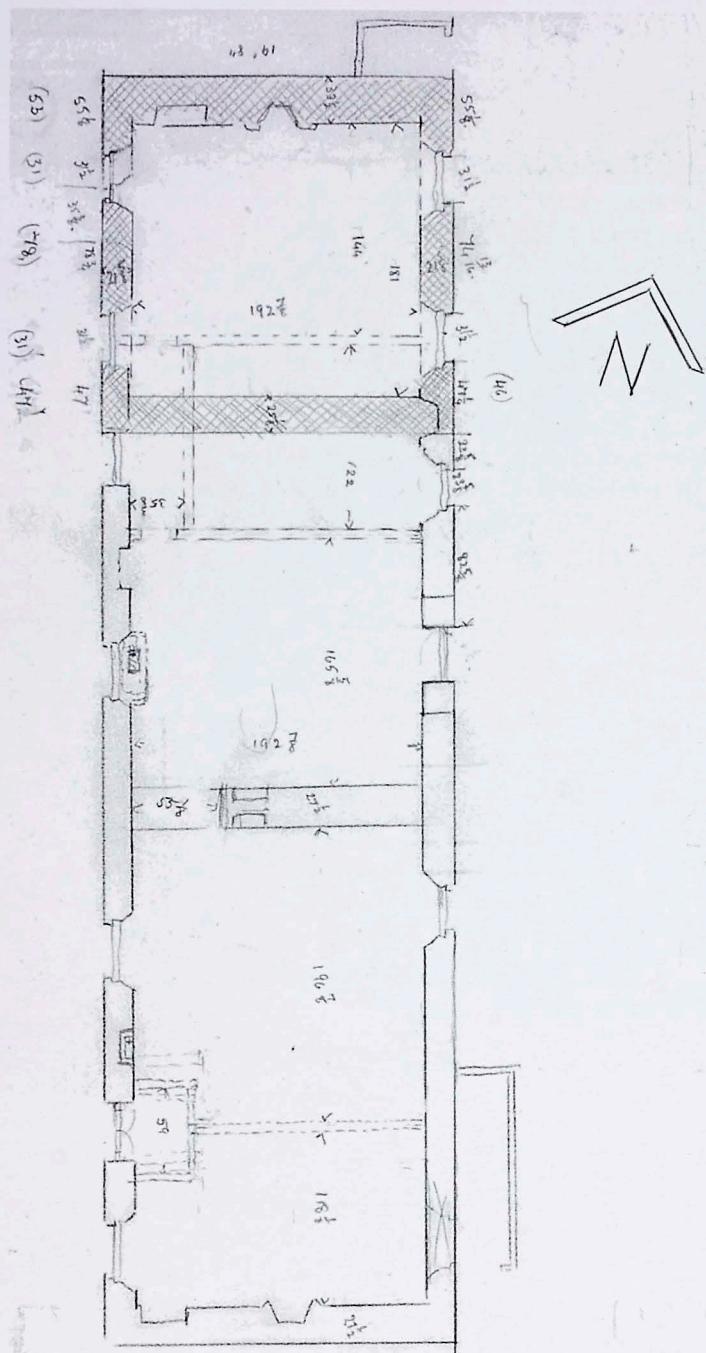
Plan of workshop, superimposed on plan of Nos. 9 and 11.
